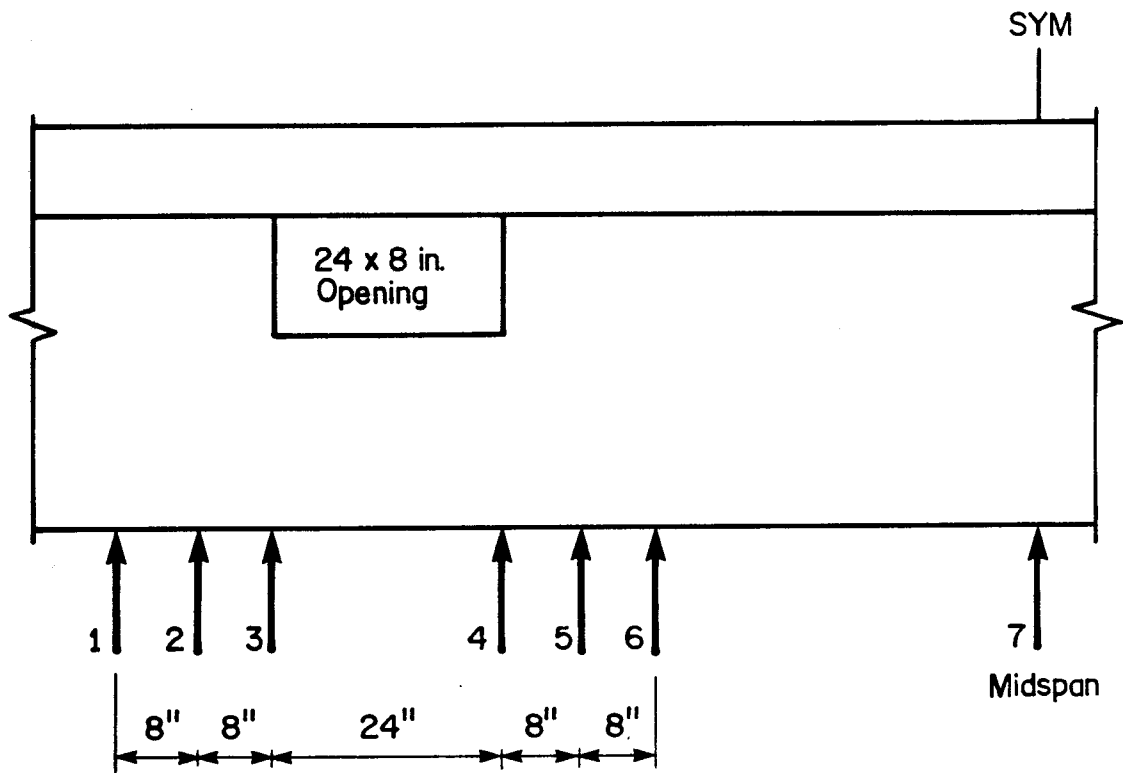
L.V.D.T. Locations - BEAM B3 and BEAM D3.
